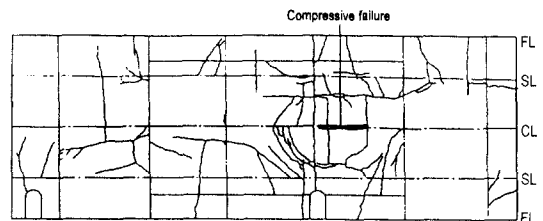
A view of tunnel lining deformation or cracks-plastic earth pressure
